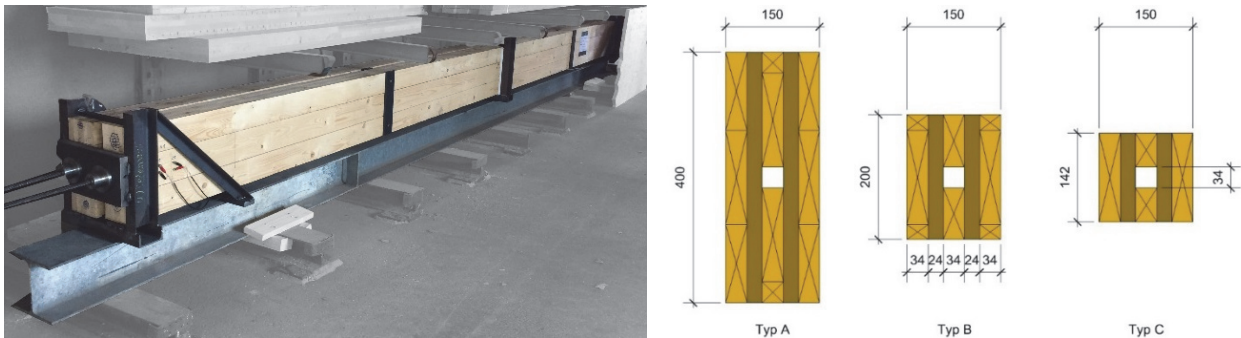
left: view of specimen B2 and C2 at the outdoor test location, right: cross sections of test types A, B, C
